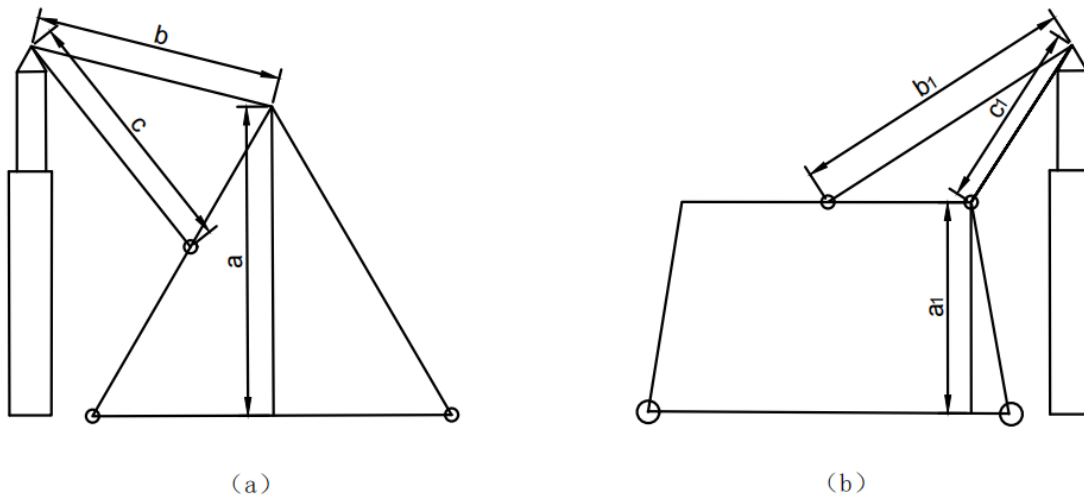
Length of section with fixed beam length(a)bridge folded(b)bridge horizontally expand
